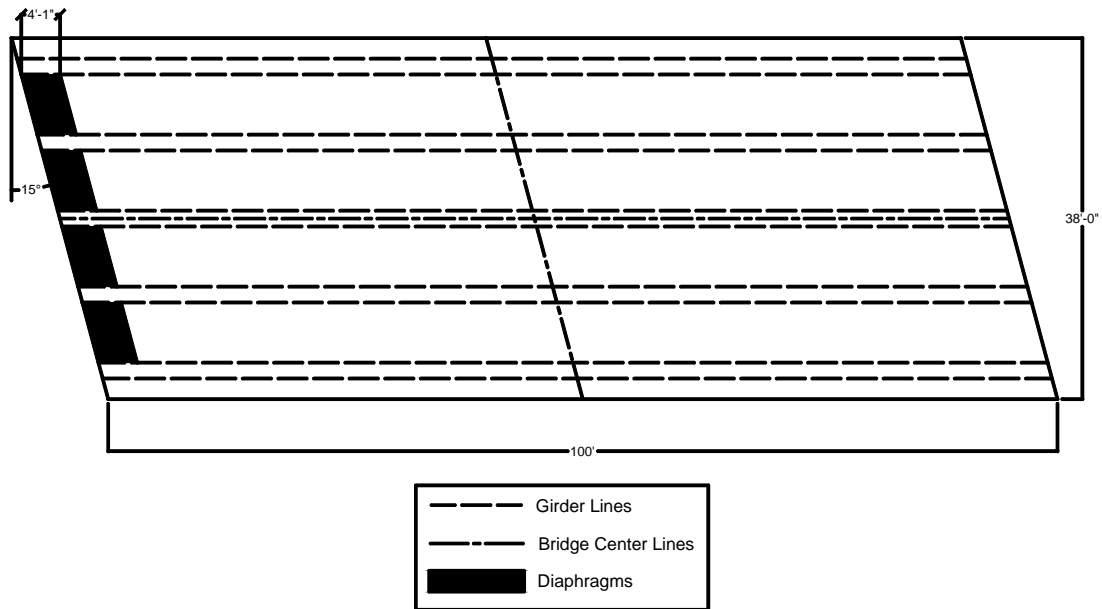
Diaphragm Configuration – Wimberley Bridge
